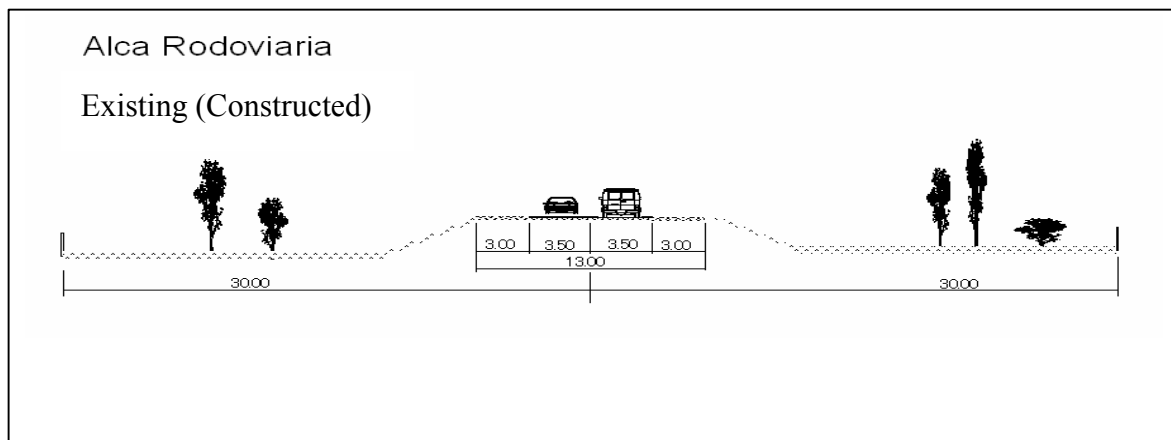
Typical Cross Section of Alca Viaria Project
